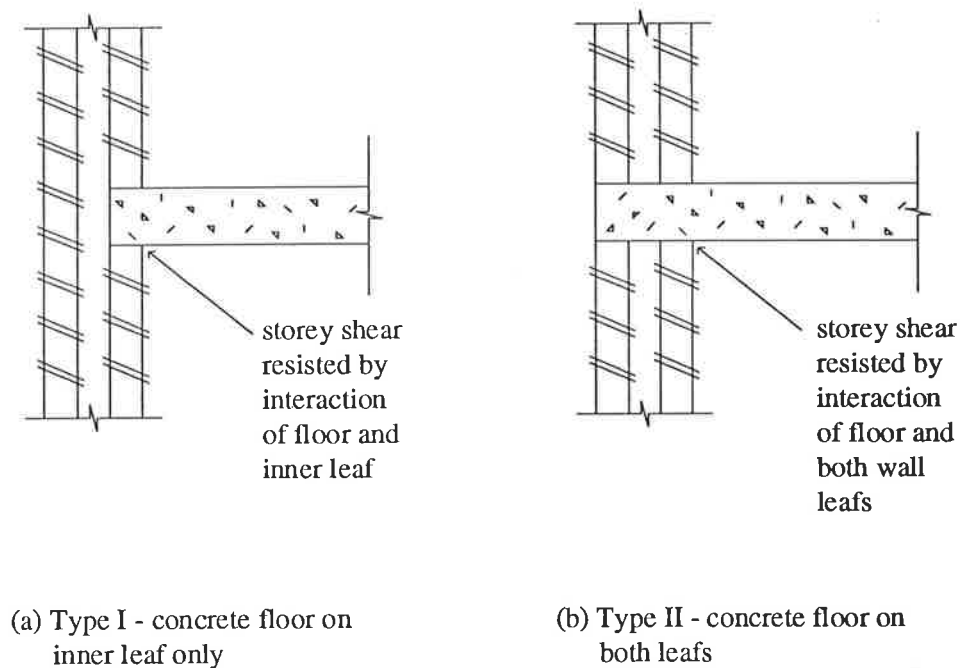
Concrete Floor to Wall Connection Details.
